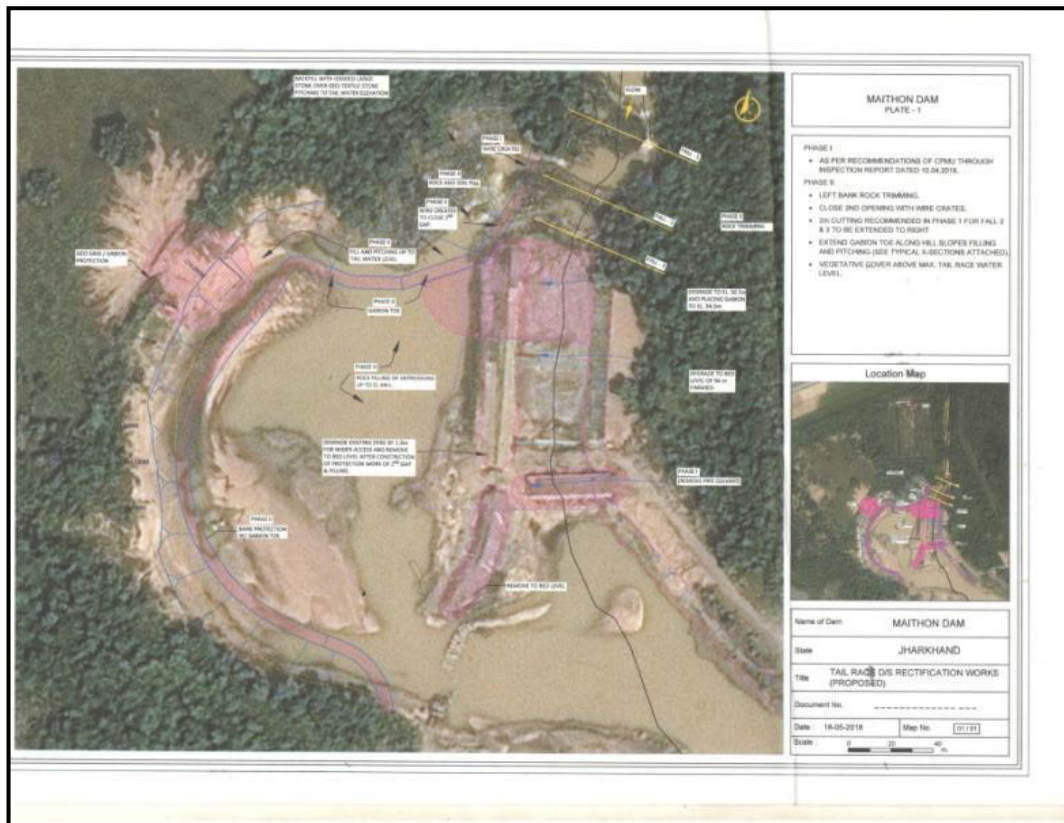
Proposed Plan of Downstream region of Maithon Tail Race channel
